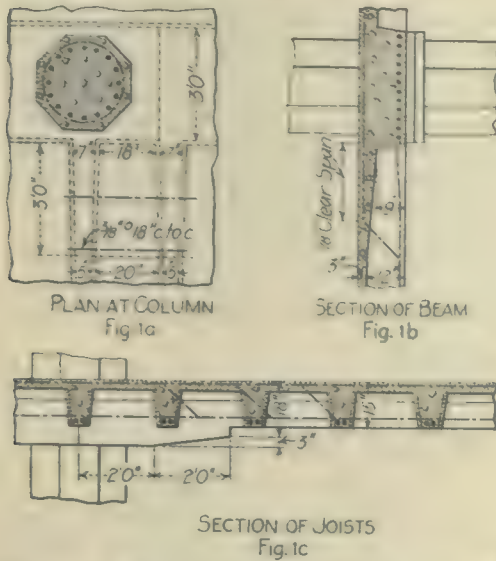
CONCRETE JOIST DESIGN ACCORDING TO J. H. BYRD
